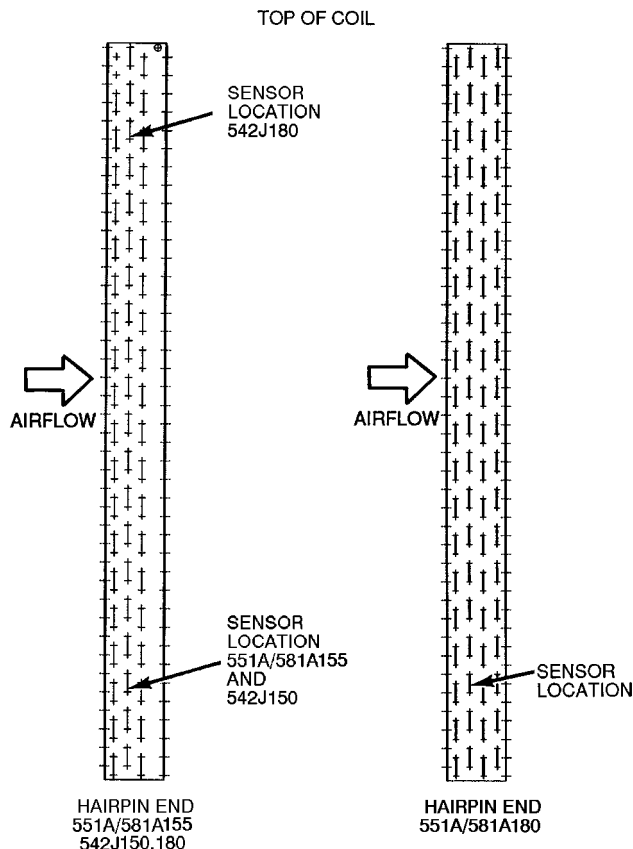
Sensor Location on Condenser Coil, 542J, 551A, and 581A Units
